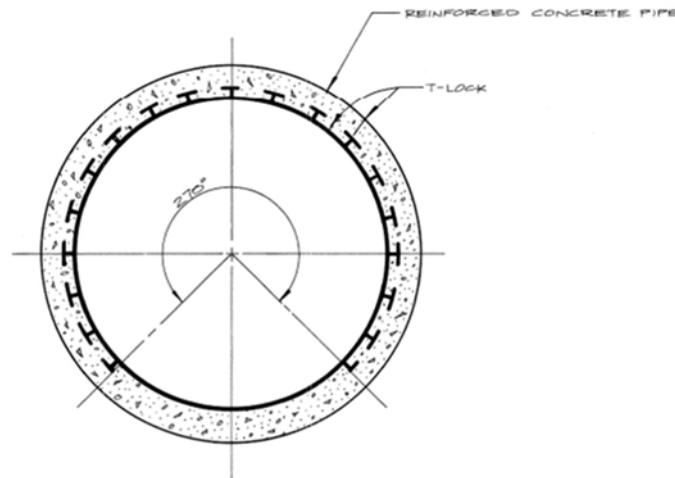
Reinforced Concrete Pipe with PVC (T-Lock) Liner
